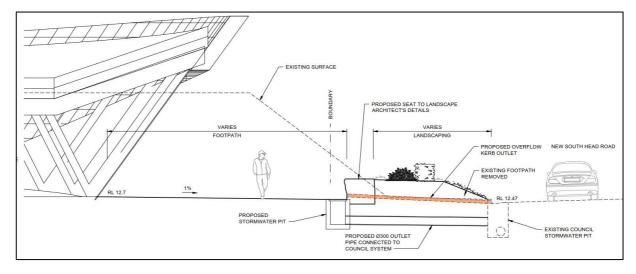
Typical section through AFC frontage to New South Head Road (Section A-A)
